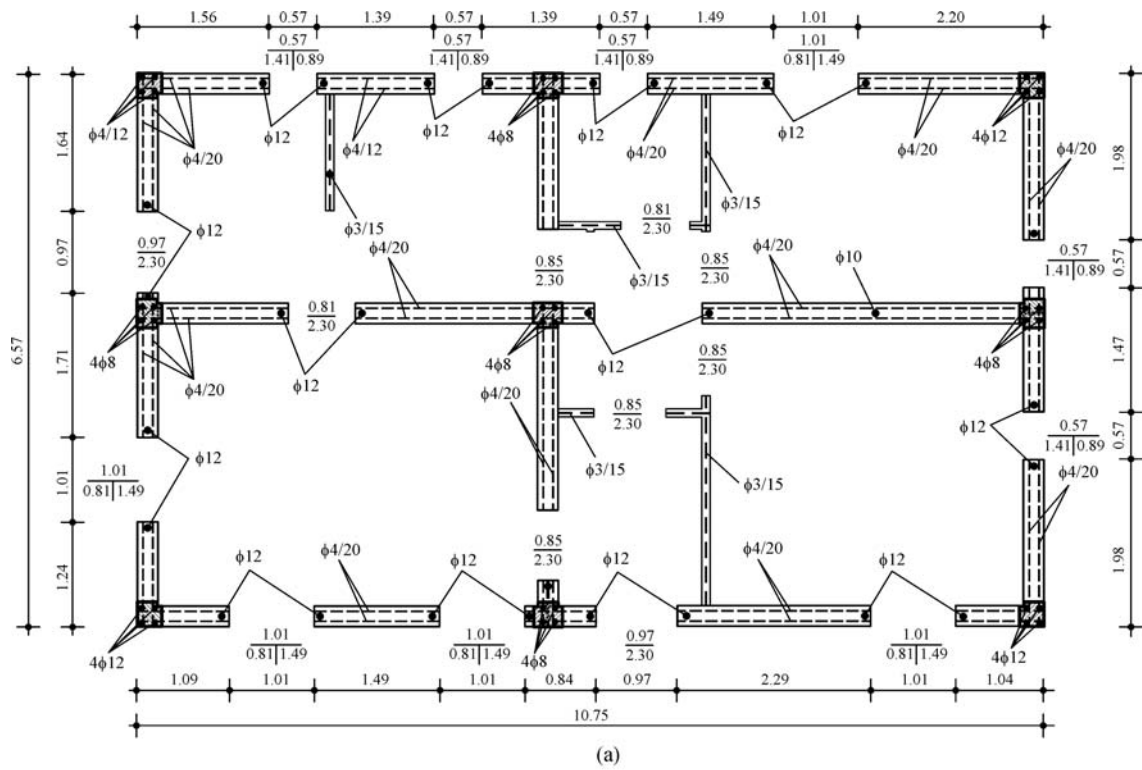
Structural print, plan view of buildings of Fig. 4 of clay brick masonry units
